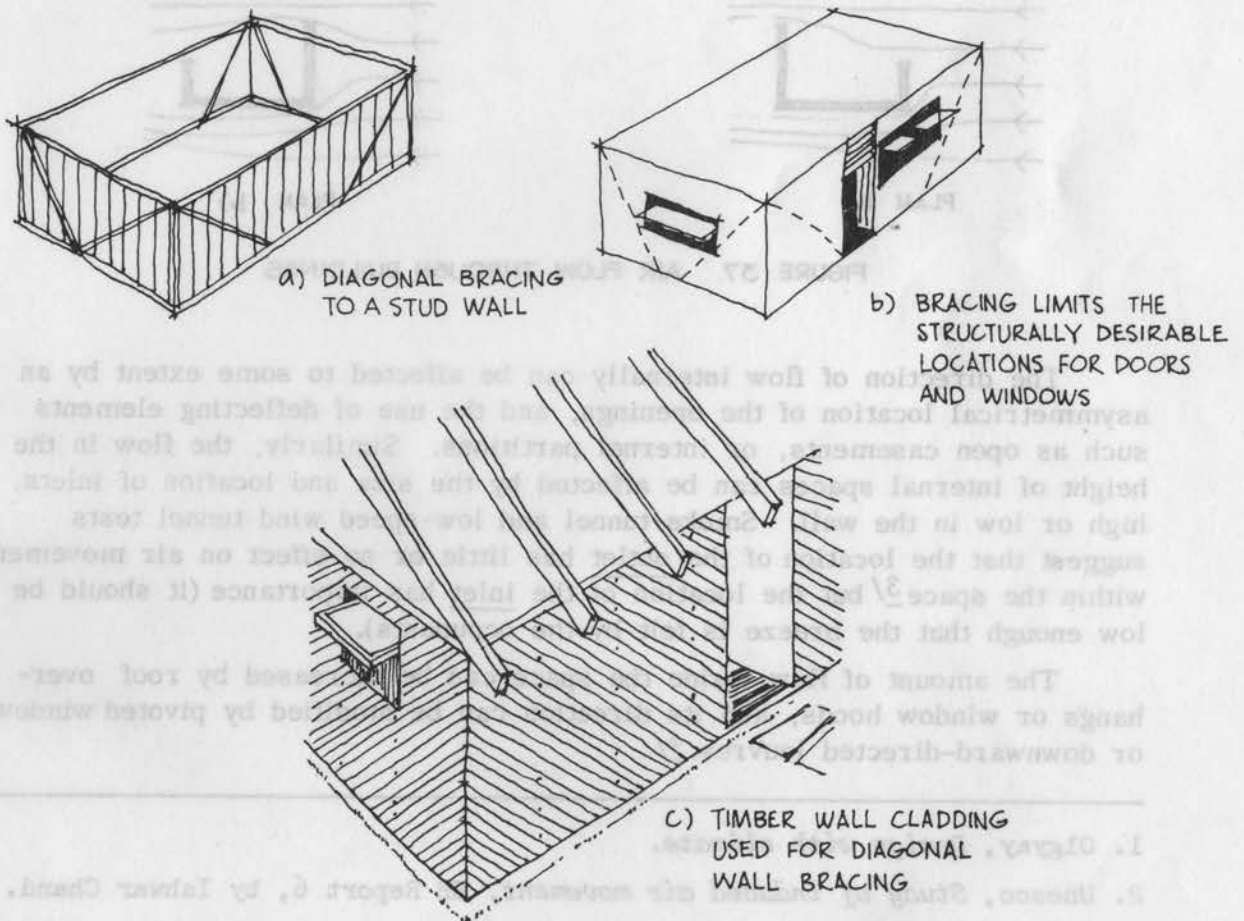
STRENGTH IN FRAMED TIMBER WALLS
